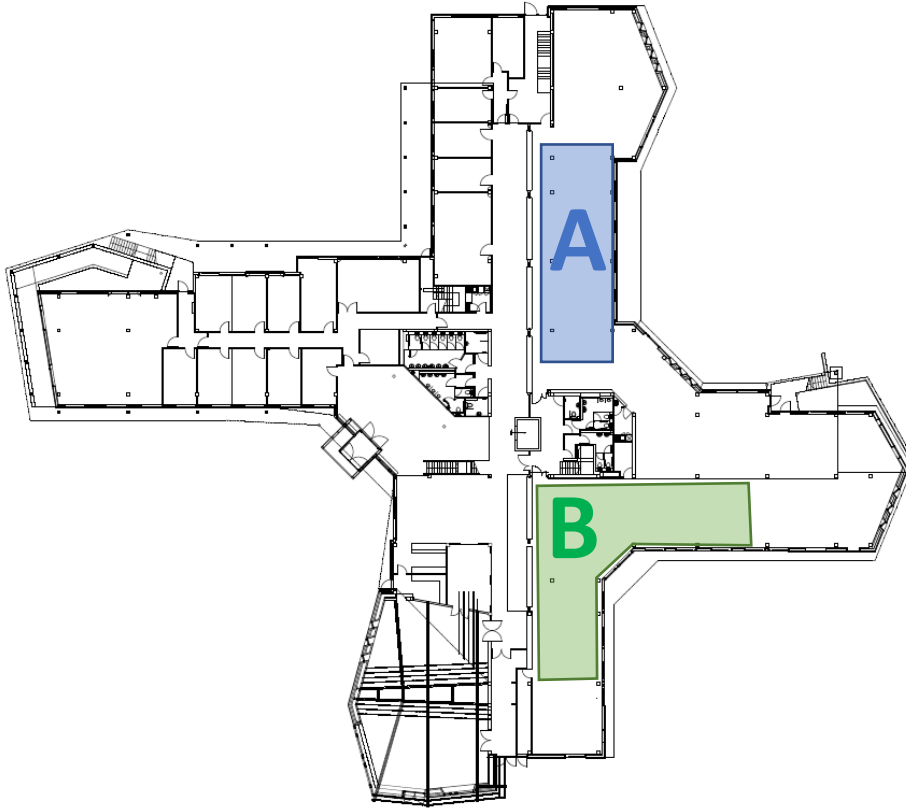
10: The ground floor plan of Building 3 and the department locations
